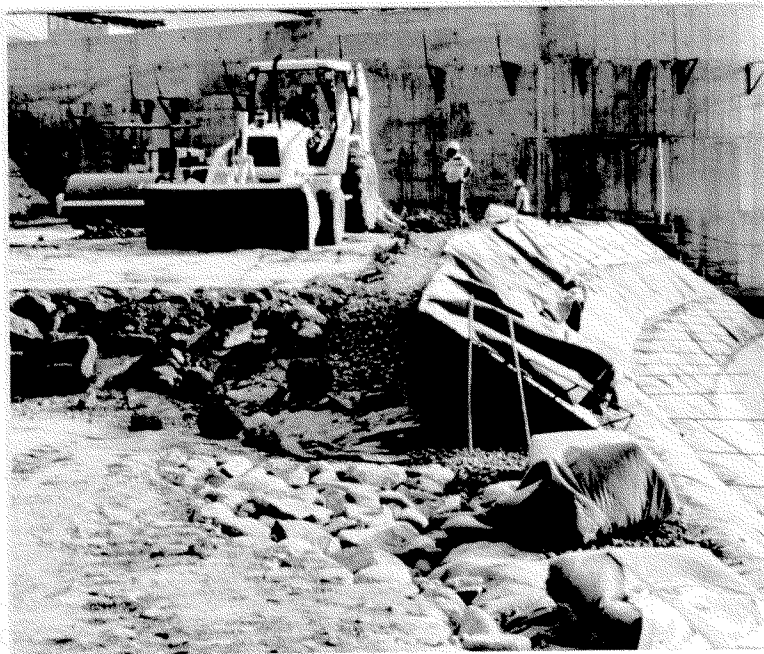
Construction of the retaining berm with geotextile reinforcement.
